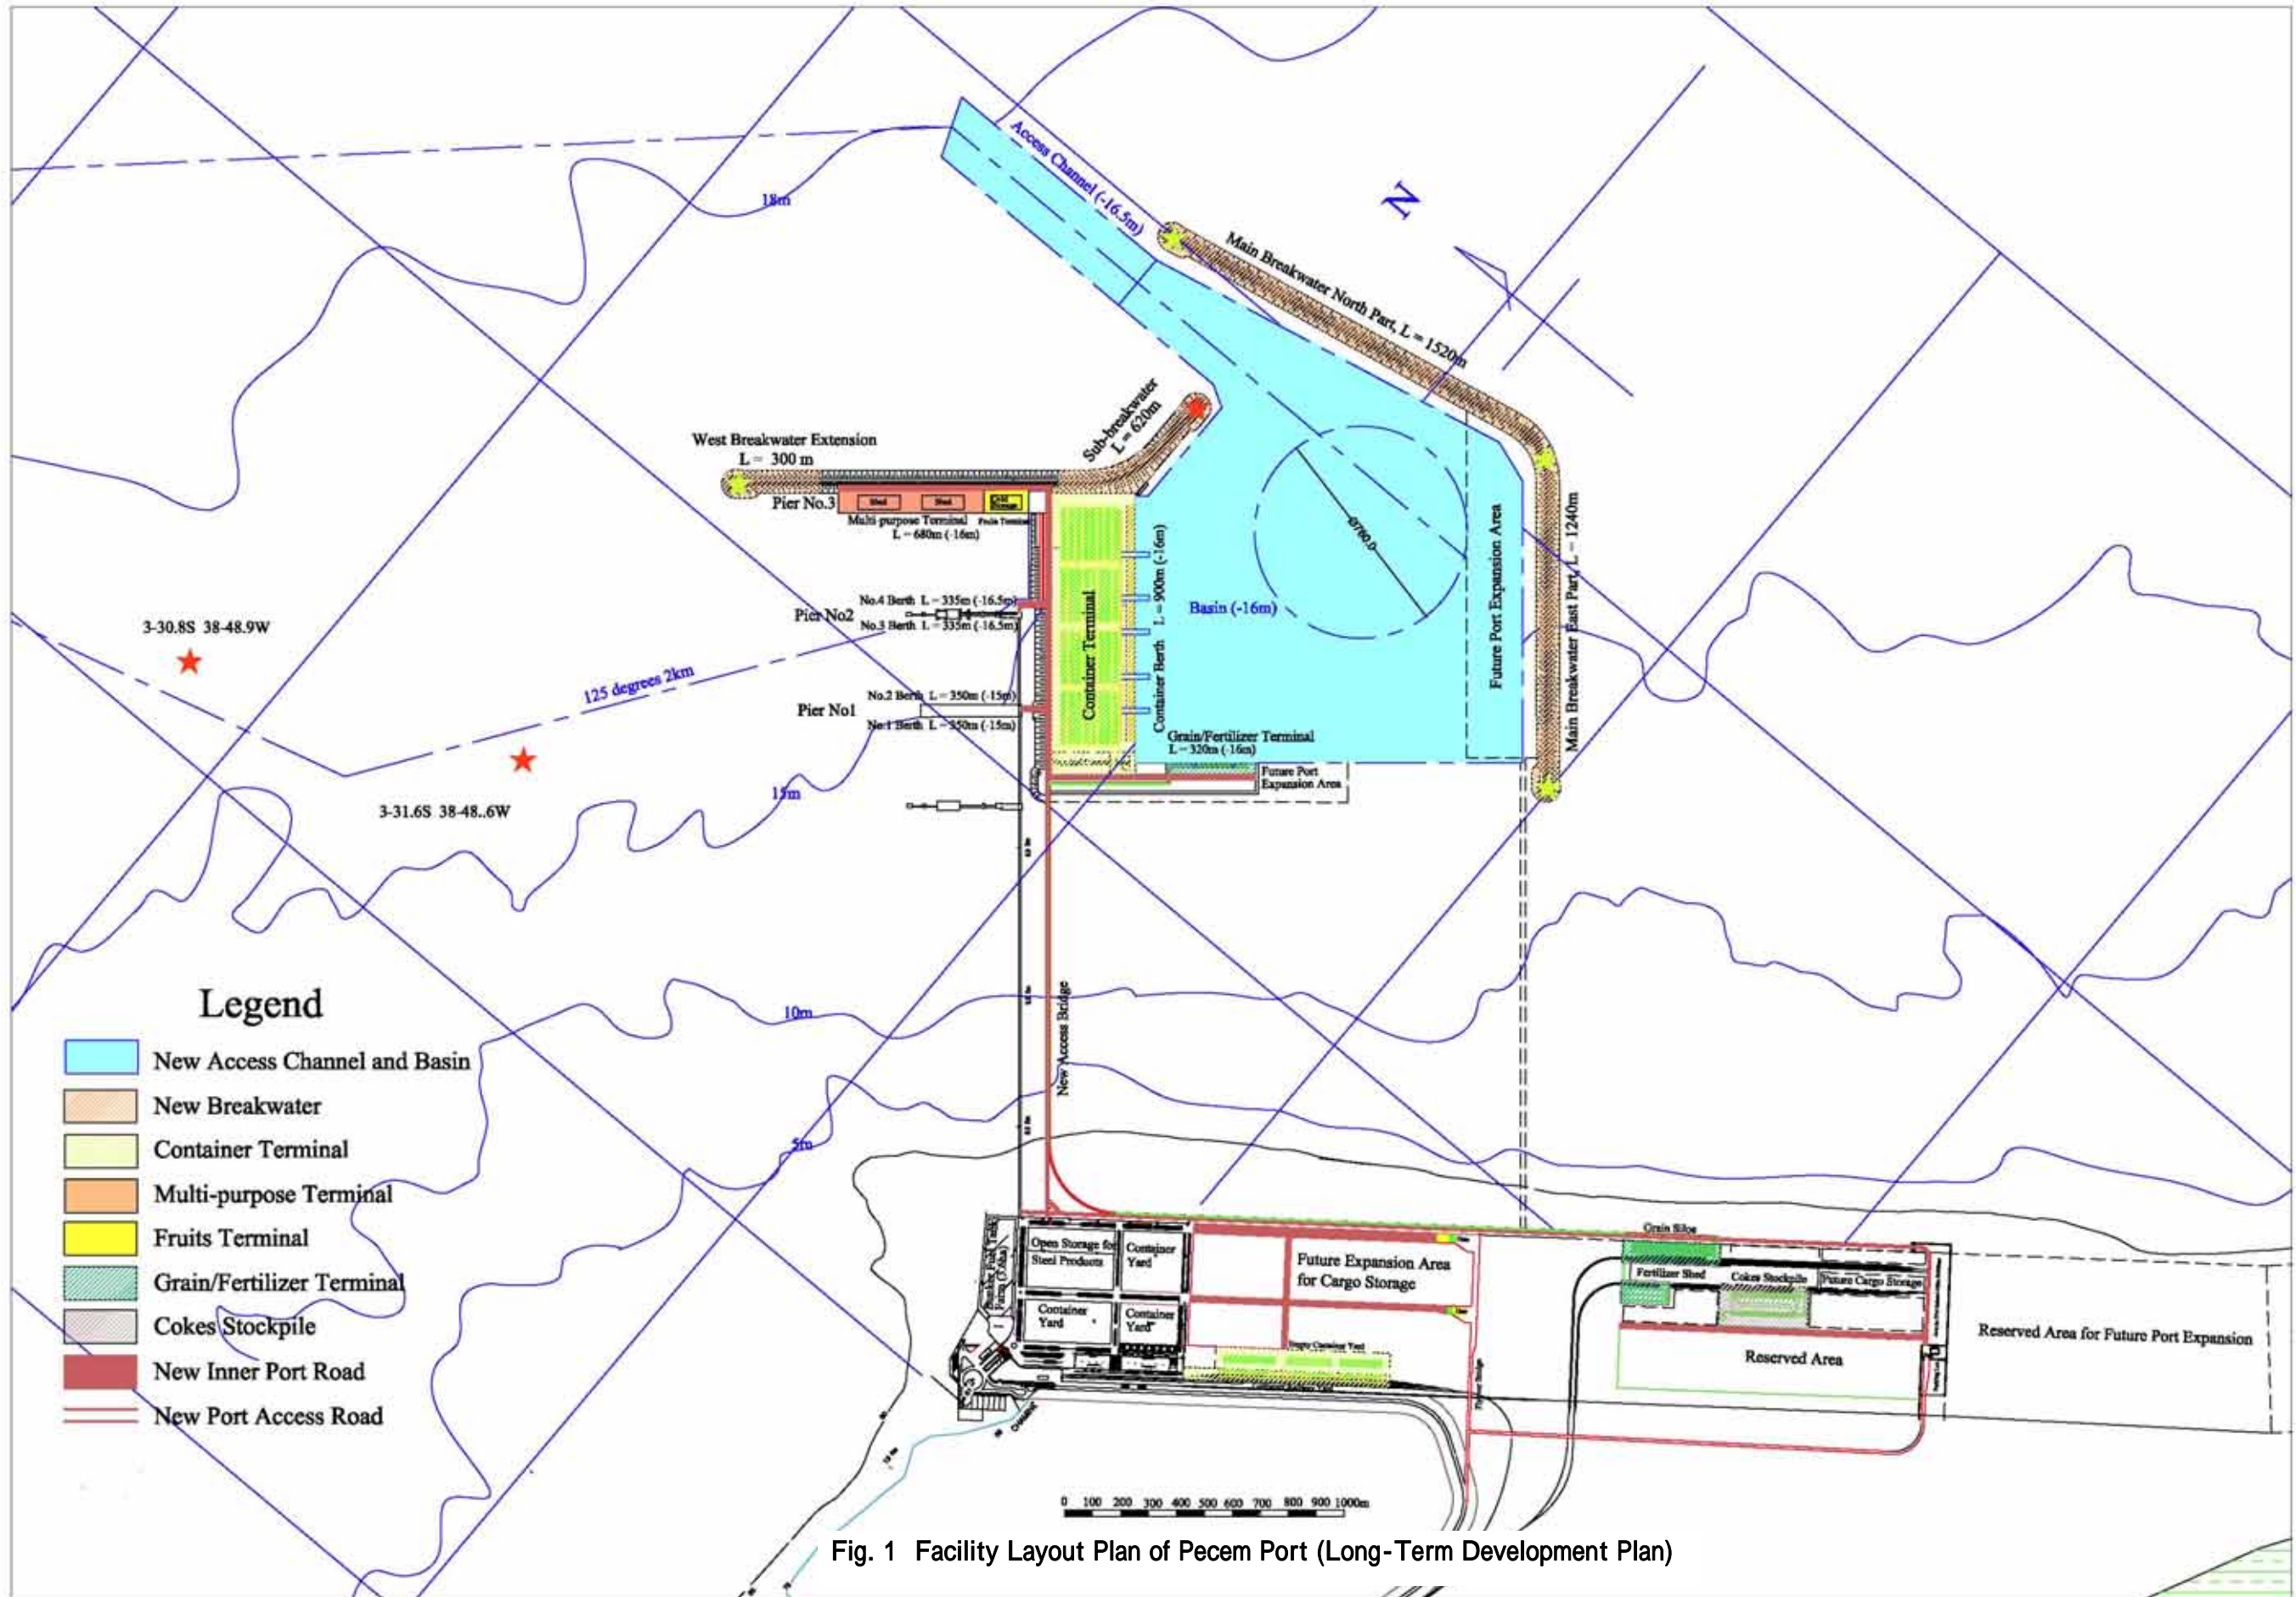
Facility Layout Plan of Pecem Port (Long-Term Development Plan)
